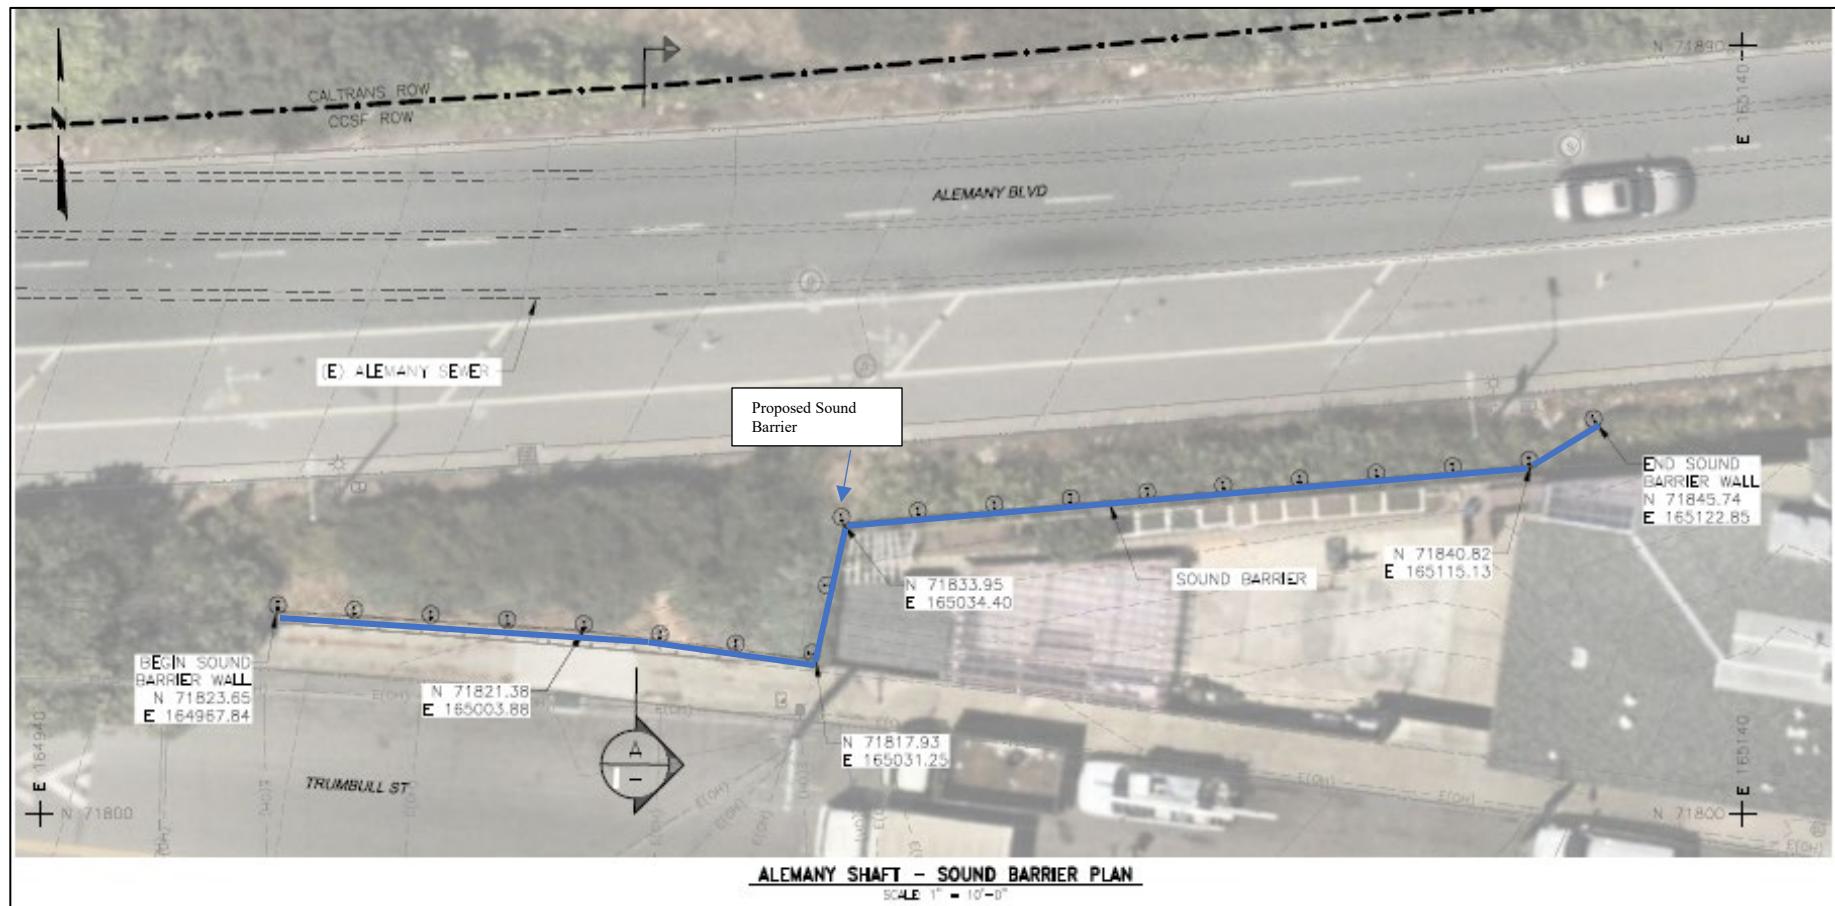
Plan View of Temporary Sound Barrier at Alemany Shaft Work Area
